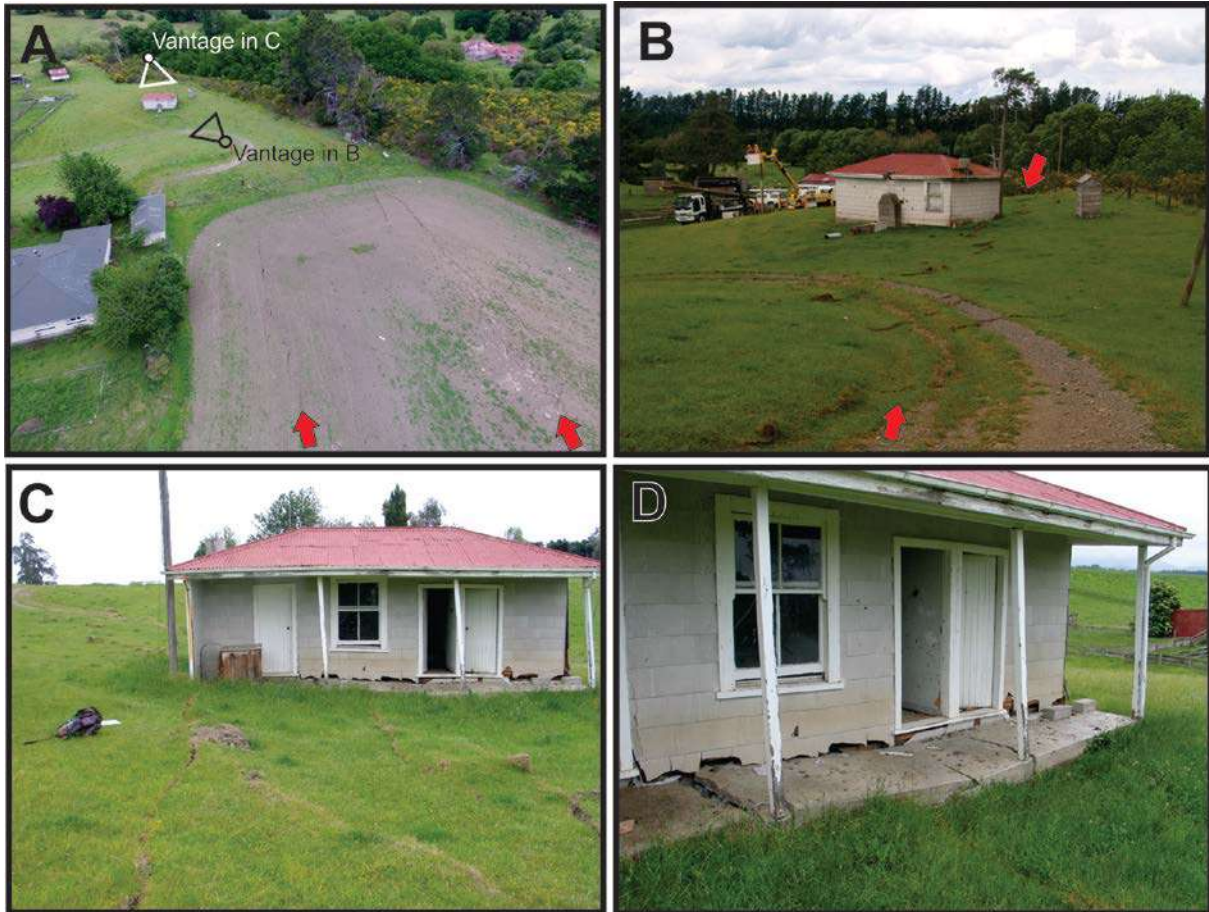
Hillview Cottage and The Humps Fault surface rupture; see Figures A2.14 and A2.29 for location (Lat: -42.6287, Long: 173.0154). (A) Oblique aerial view looking east toward the cottage along discrete dextral-normal surface fault ruptures (red arrows). Photo courtesy of Sam McColl, taken from a drone in November 2016. (B) View looking northeast. At this location, the cottage is impacted by decimetre-scale discrete fault rupture (in this case Riedel shears) and centimetres to decimetres of distributed deformation between the shears. Note the collapsed chimney. Photo by Clark Fenton, taken in November 2016. (C, D) Details of damage to the cottage caused by decimetre-scale surface fault rupture. Photos by Jarg Pettinga, taken in November 2016.
